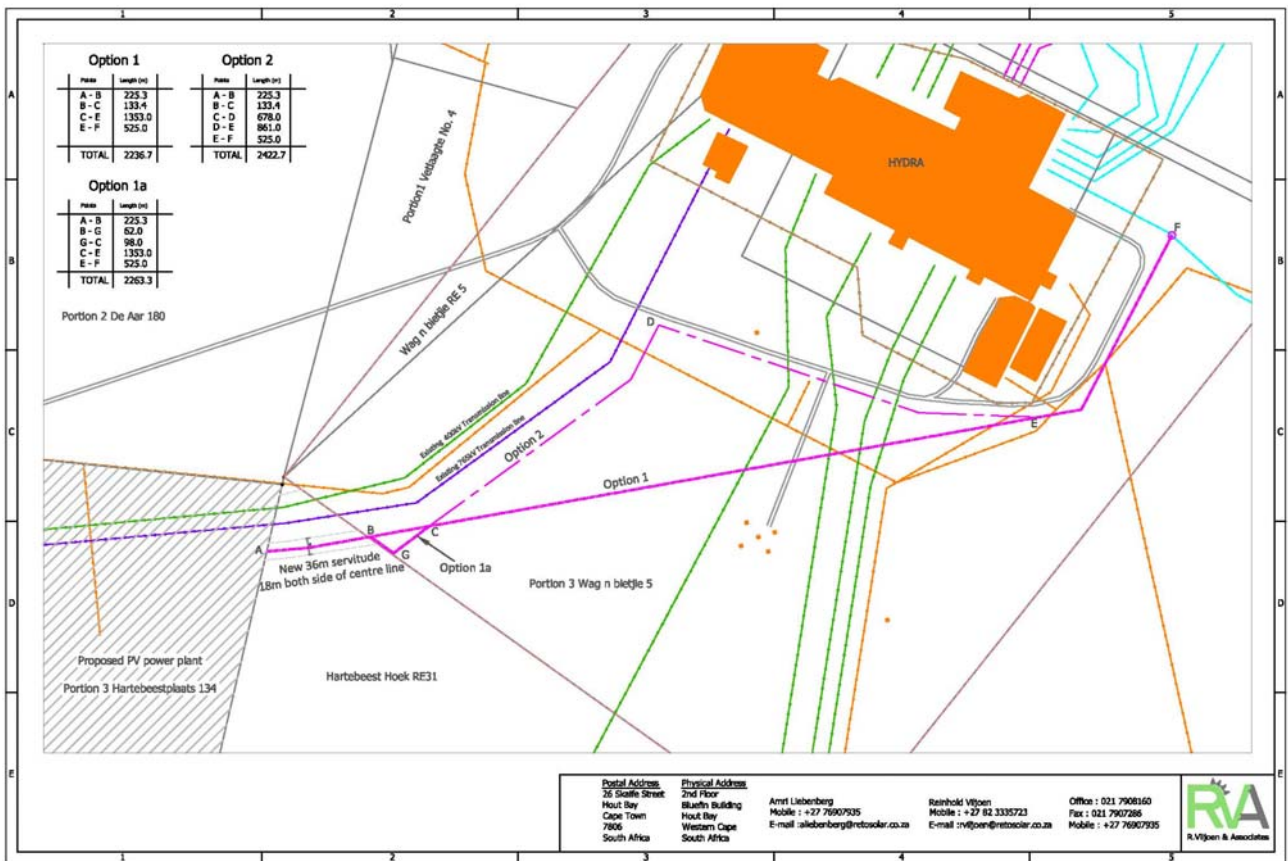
Three alternative power line route options and connection points to the Hydra substation. Existing power line connections are also indicated.
